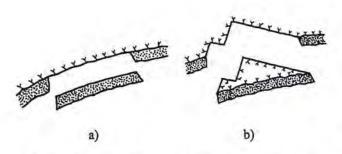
Two basic types of shotcrete failure: (a) fallout of shotcrete, indicating poor adhesion, and (b) fallout of shotcrete and rock, indicating zones of weak rock (Malmgren, 1999).
